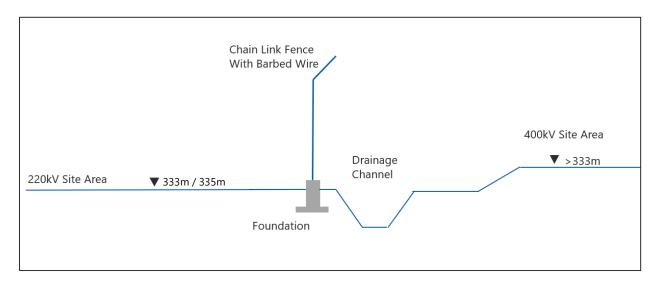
External drainage collector (400kV site side) cross-section (sketch not to scale)
